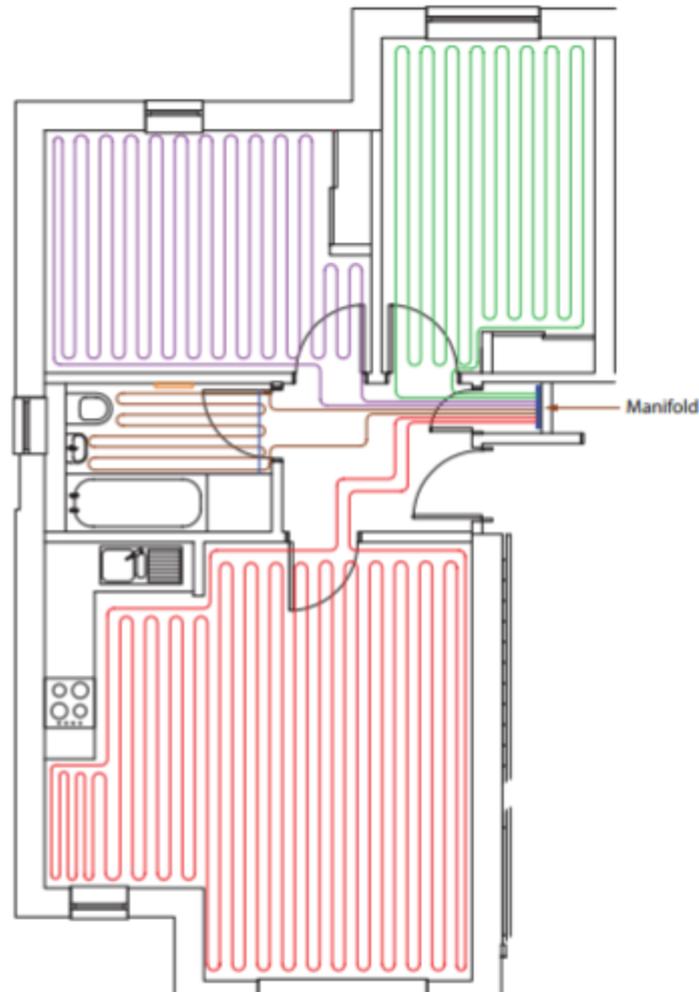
Typical UFH piping system layout for an apartment (Bleicher & Vatal, 2016)
